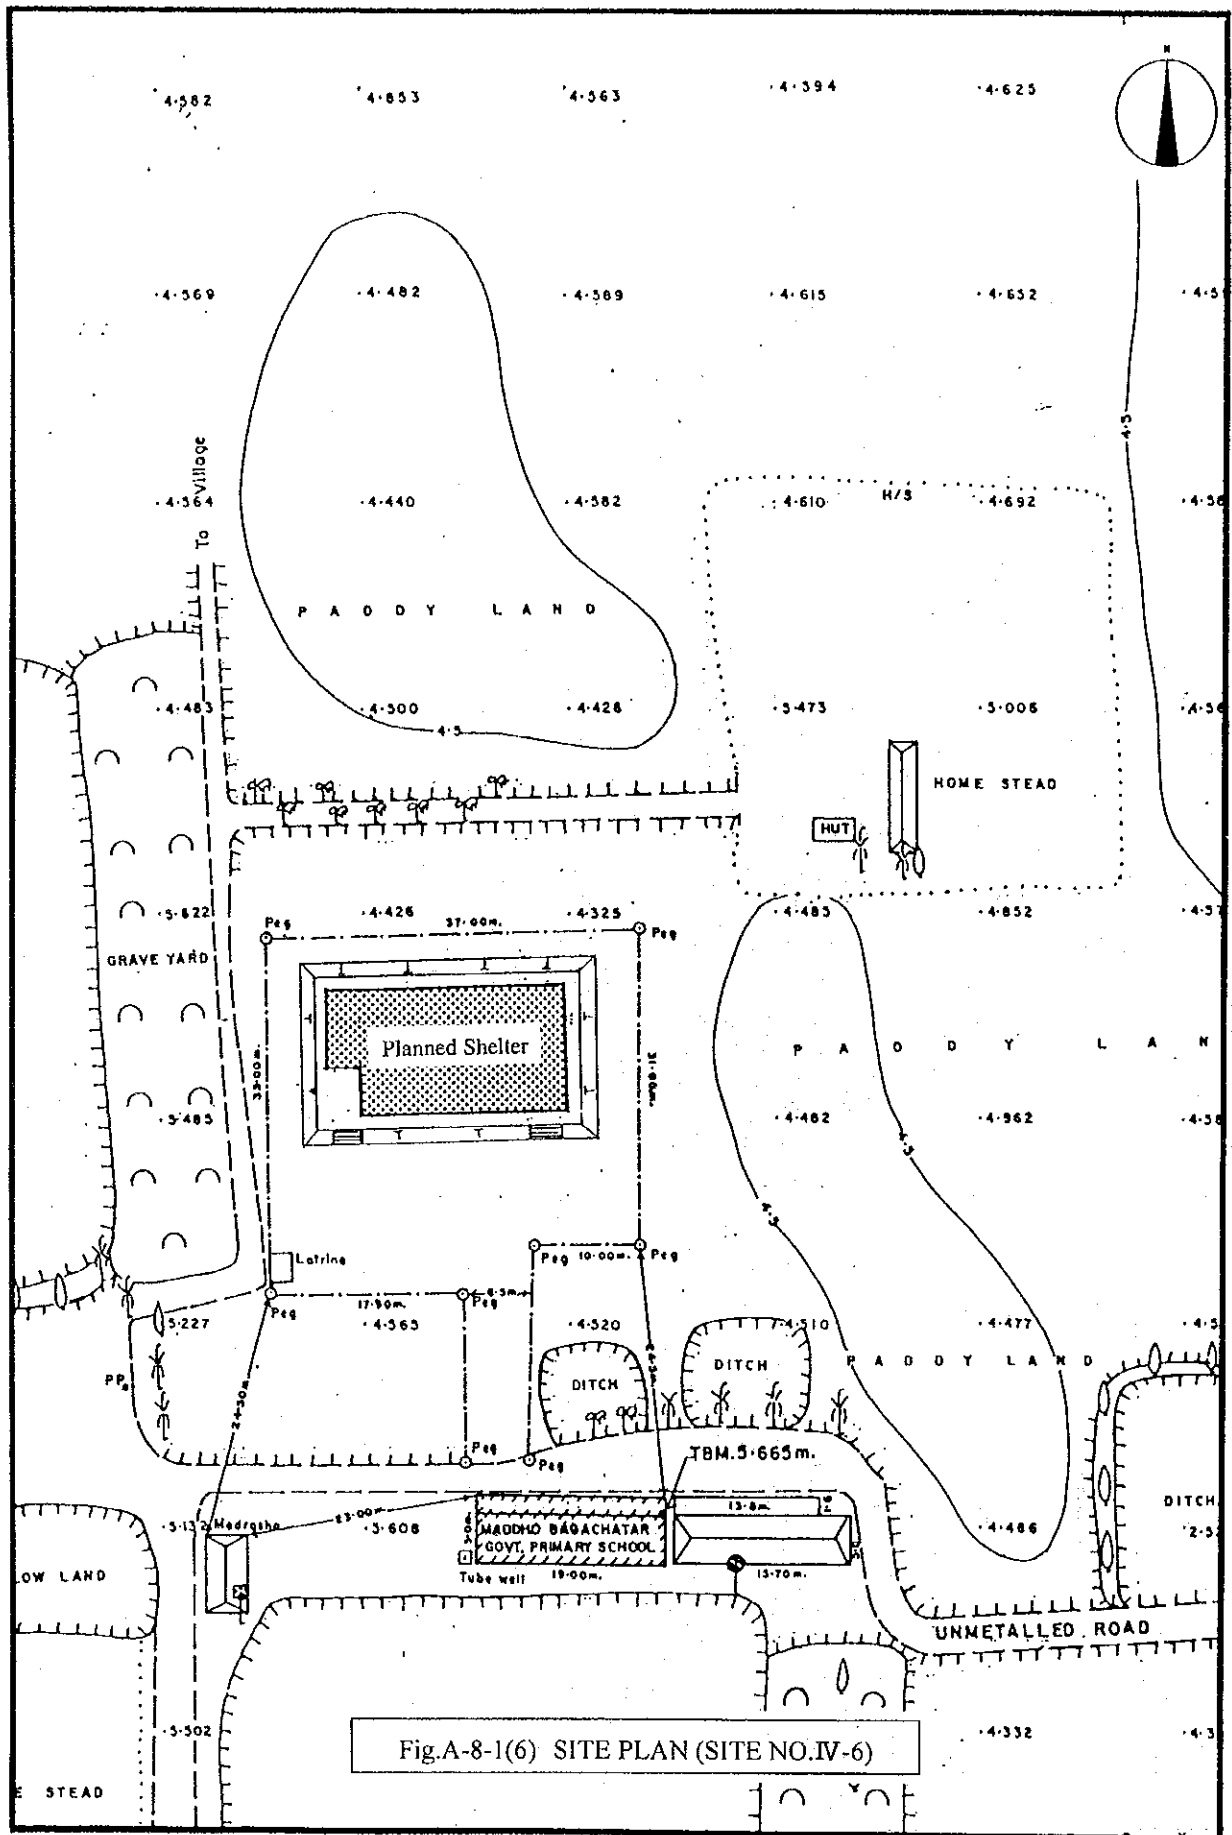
(6) SITE PLAN (SITE NO.IV-6)
